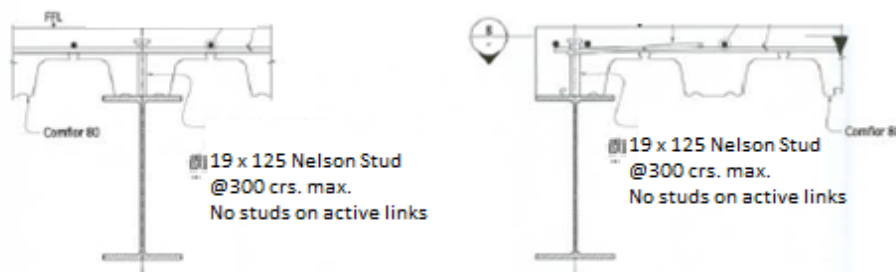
Floor Slab – Beam Connection Details (Christchurch City Council 2016c)
